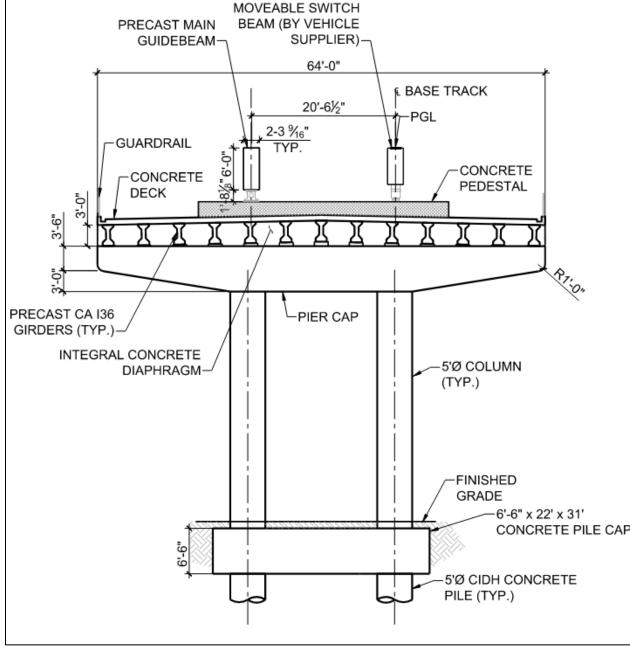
Typical Monorail Beam Switch Cross-Section
